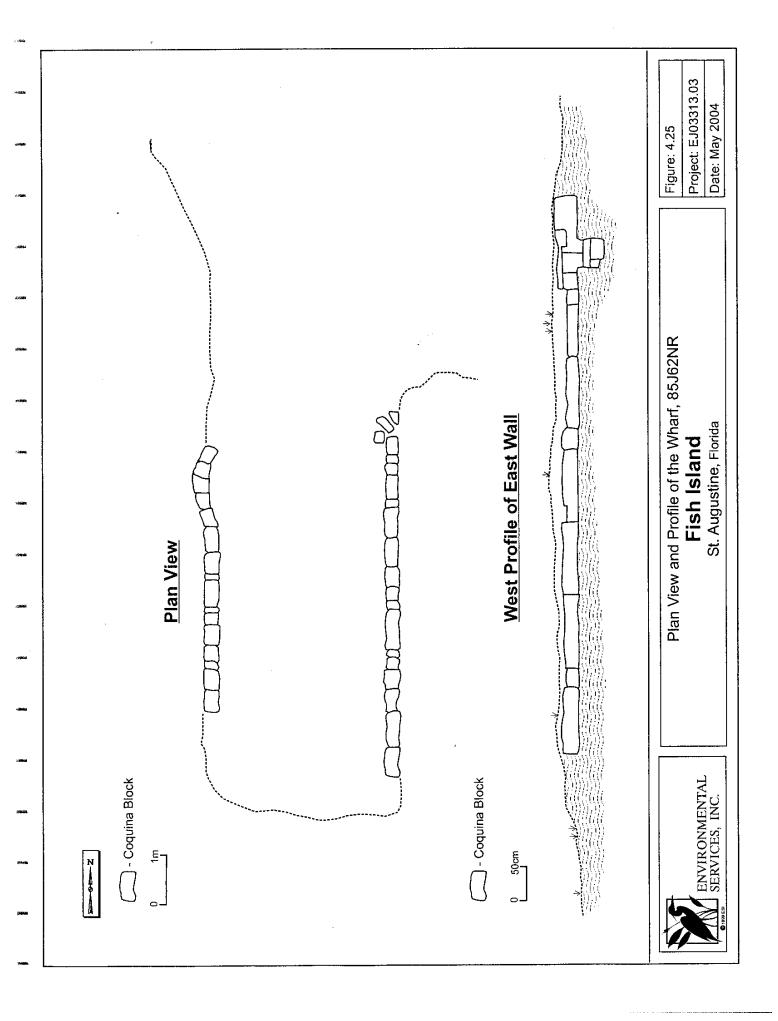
Wharf Excavation of East Wall, 8SJ62NR
